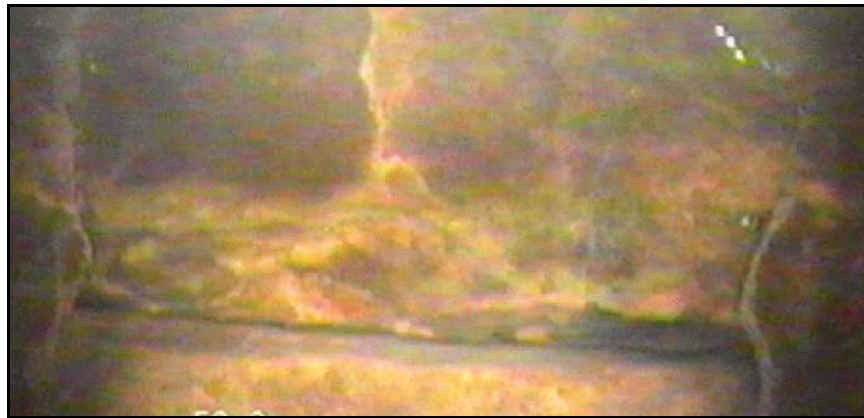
Just into the masonry conduit an open defect (crack), shown in the lower part of the figure, exists in the crown of the conduit. This defect allowed sandy materials to enter the conduit.
